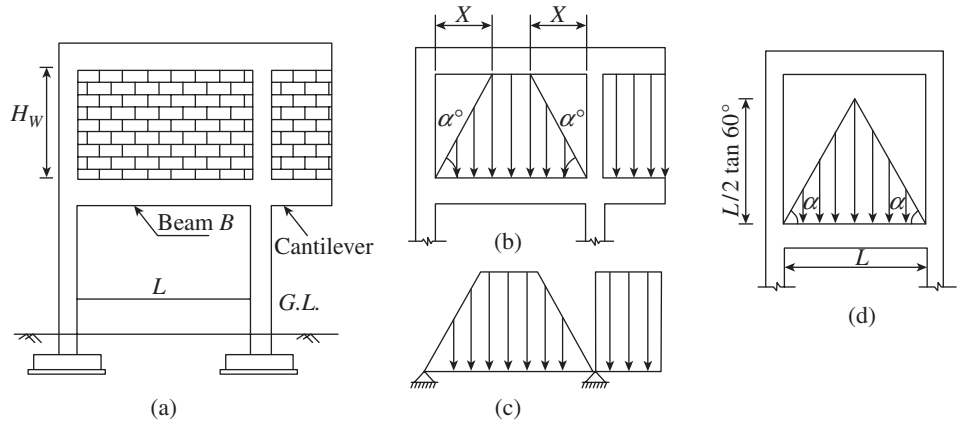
Consideration of wall loads (a) Typical frame with walls (b) Loads transferred to columns and beams (c) Load on beam due to walls (d) Short span walls
